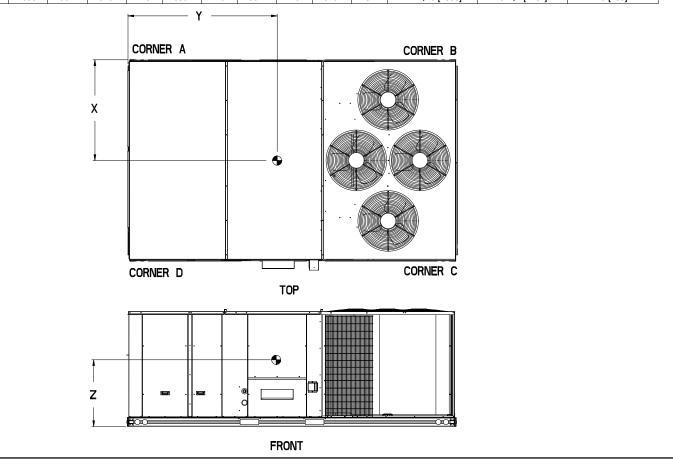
Unit Dimensional Drawing: 20 & 25 Ton, RAS240/243, 300/303
